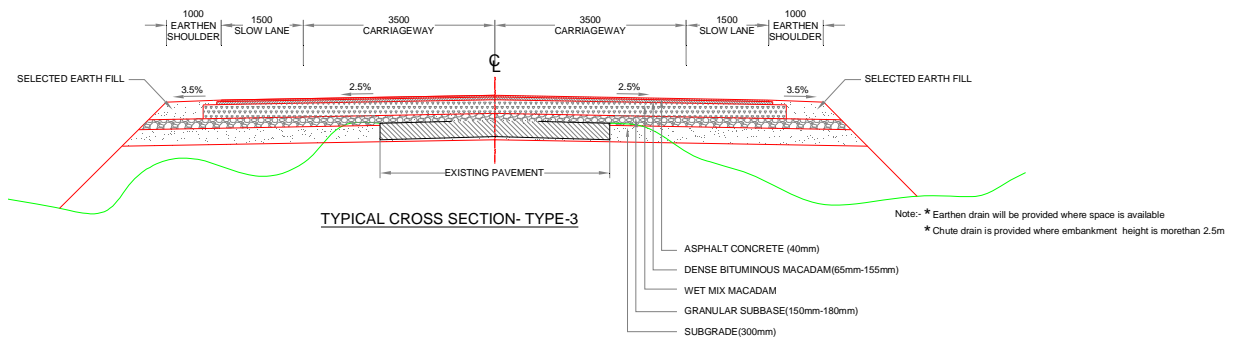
TYPICAL CROSS SECTION- TYPE-3
